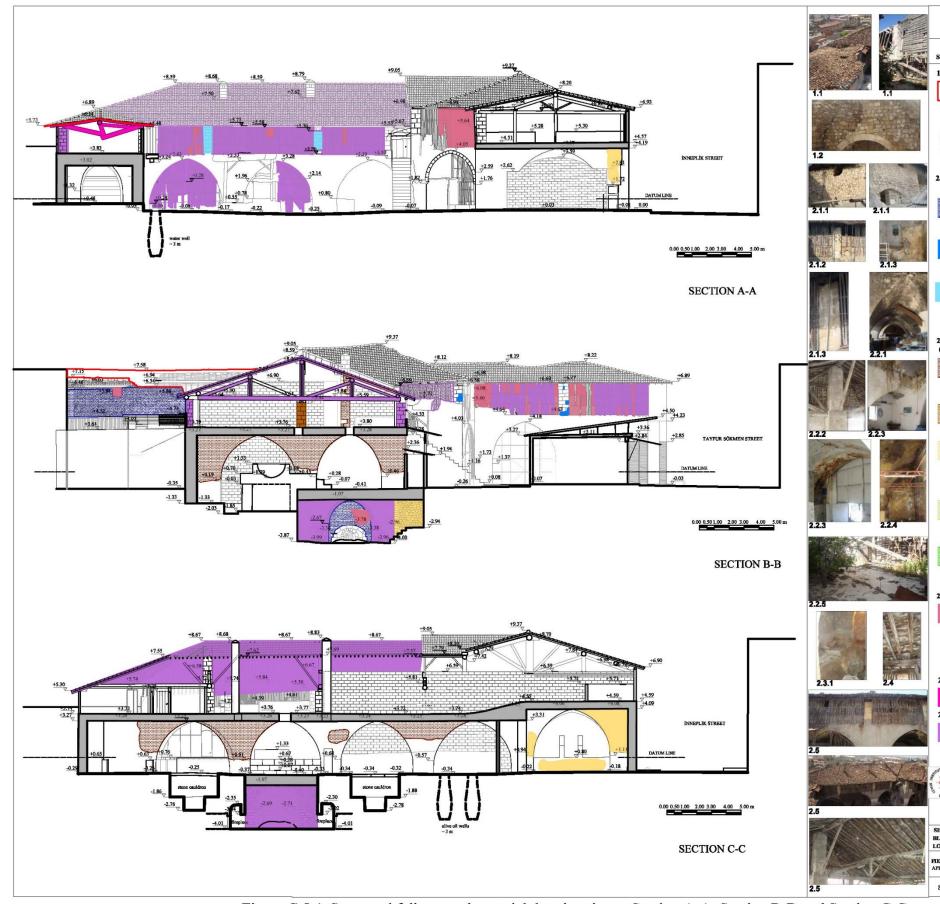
Structural failures and material deteriorations – Section A-A, Section B-B and Section C-C
